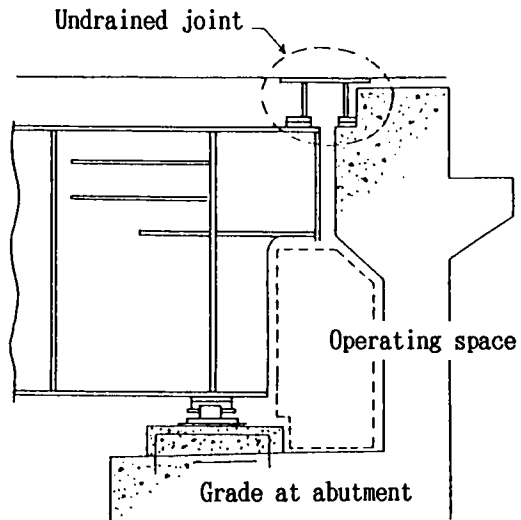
Undrained joint between approach and bridge deck and grade at abutment should be provided.¹⁷⁾
